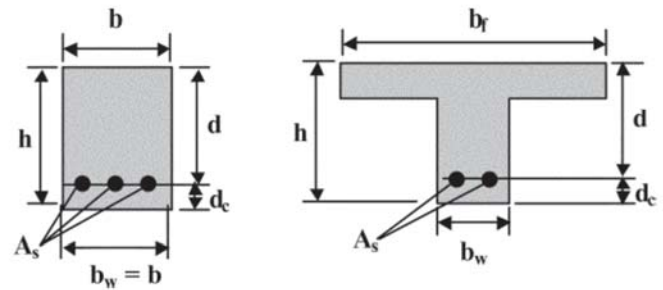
Rectangular section and T-shaped section with flange in compression.
